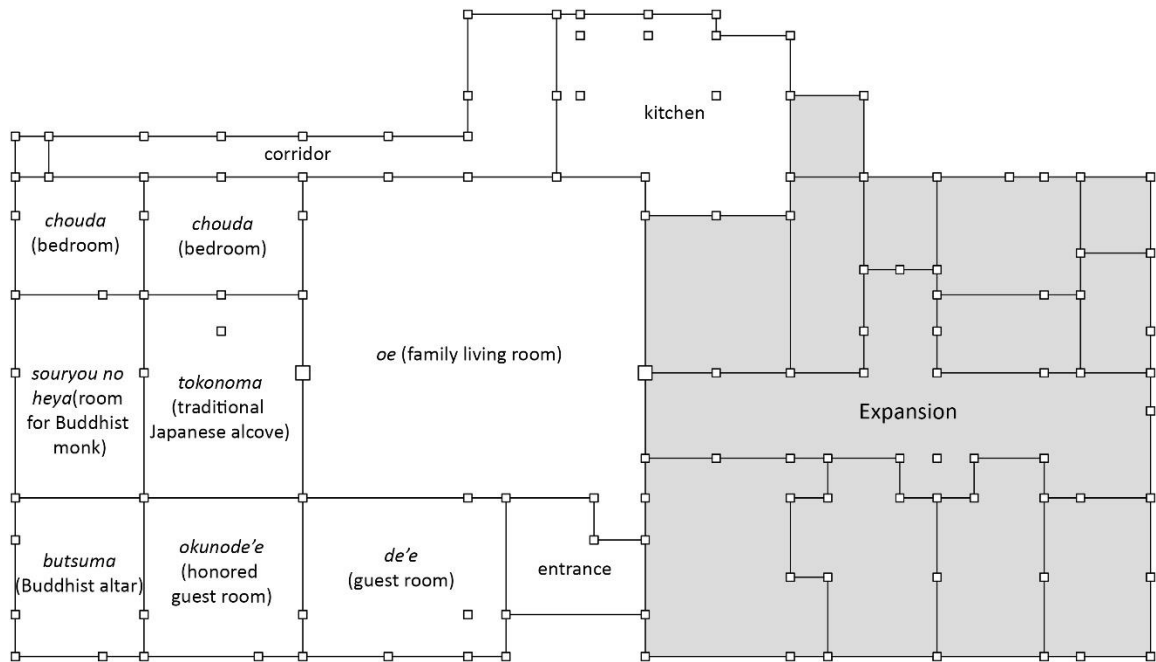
Spatial Layout of Kanda Residence, First Floor. Source: Author.
